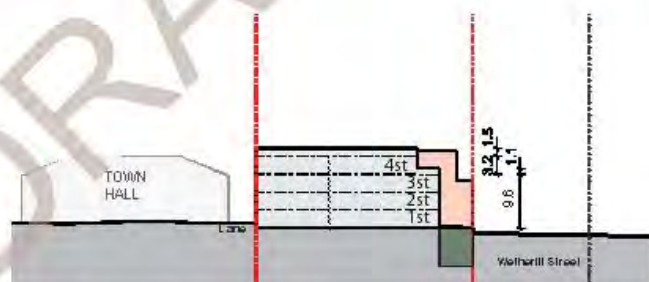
Wetherill Street - Building envelope - Section A-A
